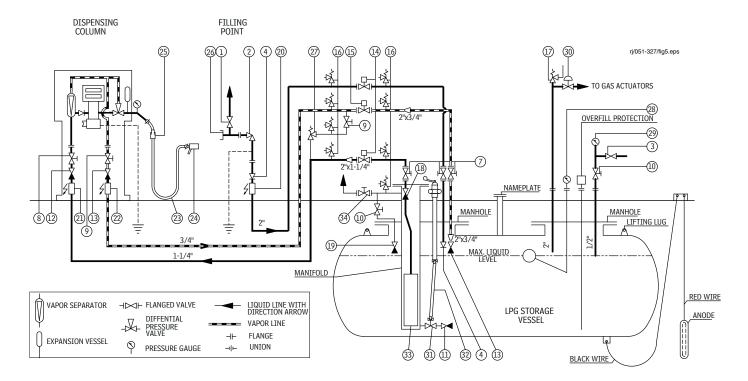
Typical Scheme For An Underground LPG Storage Tank With Vertical Submersible Pump-Motor Unit
